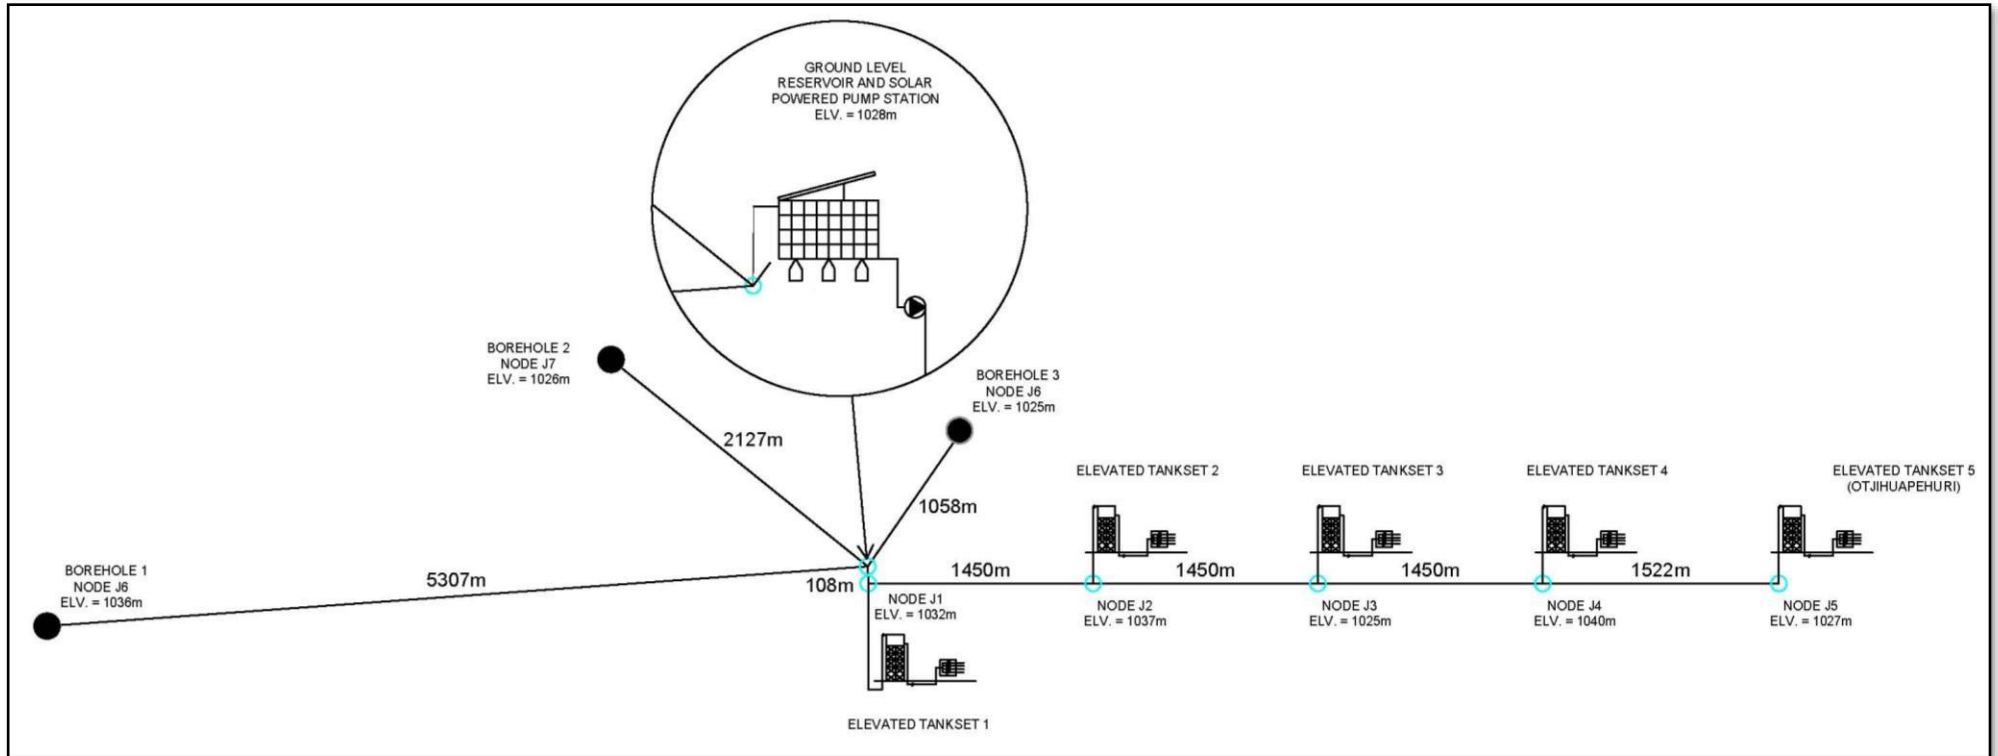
Schematic Layout of the Proposed Eiseb South Water Supply Scheme
